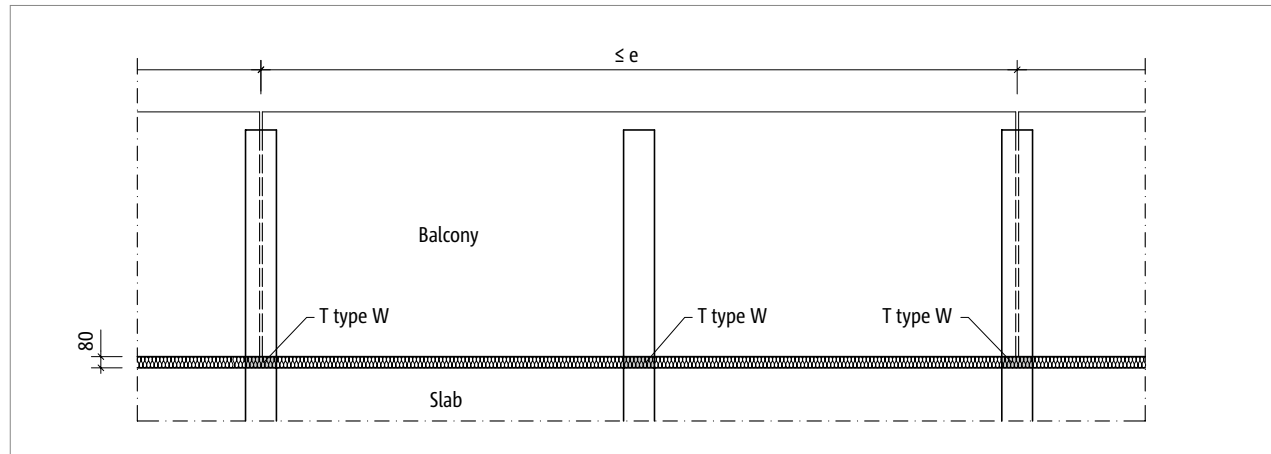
Schöck Isokorb® T type W: Expansion joint spacing
